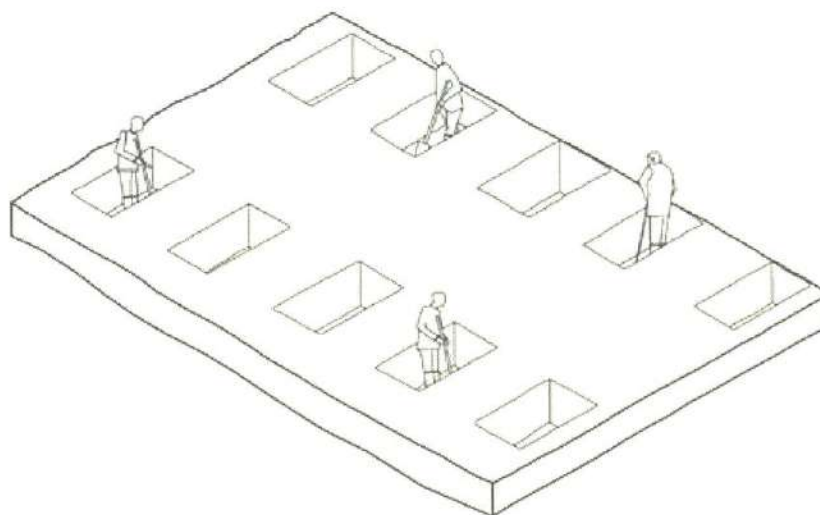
Digging holes in a platform at the locations of the wooden piers
